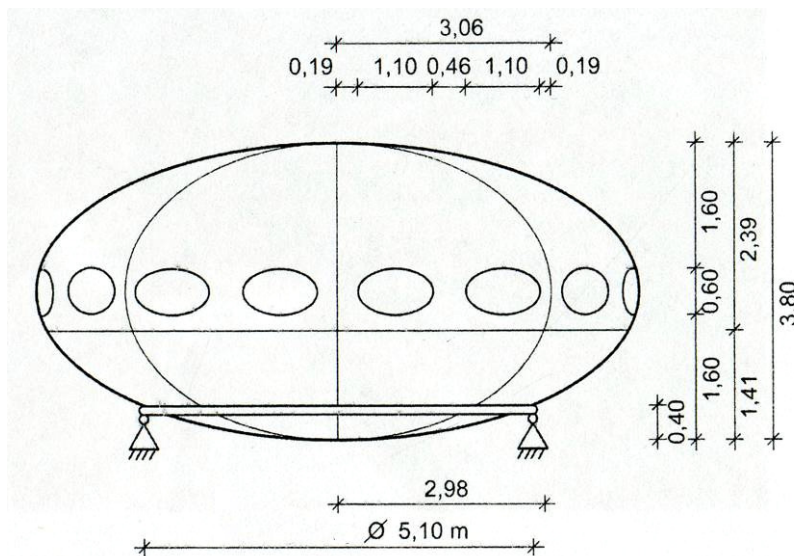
Dimensional drawing of the exterior. (Rasier 2002)
